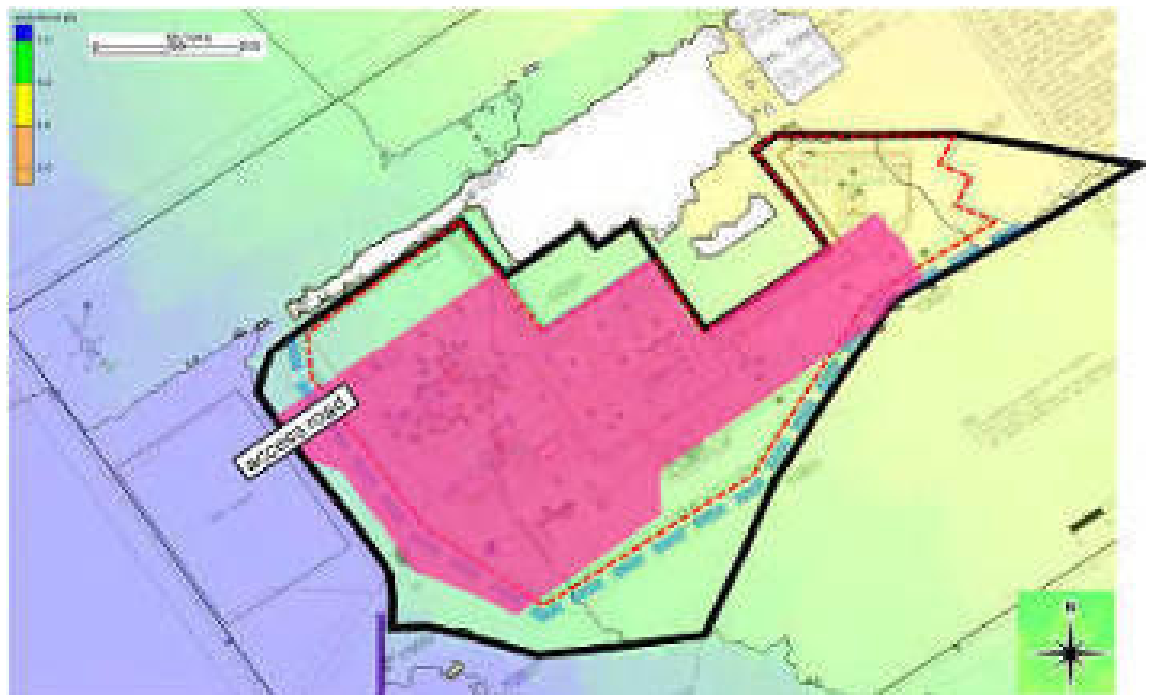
Overview of power block site layout December 2017 (magenta with new access road) with previous layouts. Planning state August 2016: Flood dike lines (dashed red) with drainage canal / flood flow path (dashed blue). The black polygon shows the entire project area (earliest dike line assumed), the coloured background indicates the inundation pattern in the current state.
